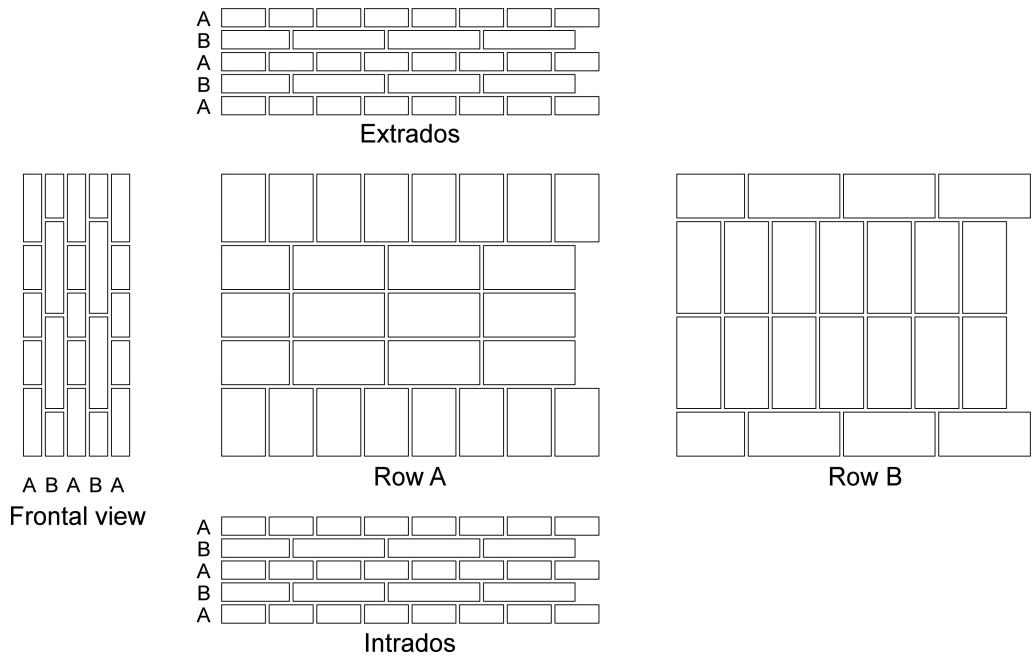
Hypothetic arrangement of bricks, the two rows of bricks
